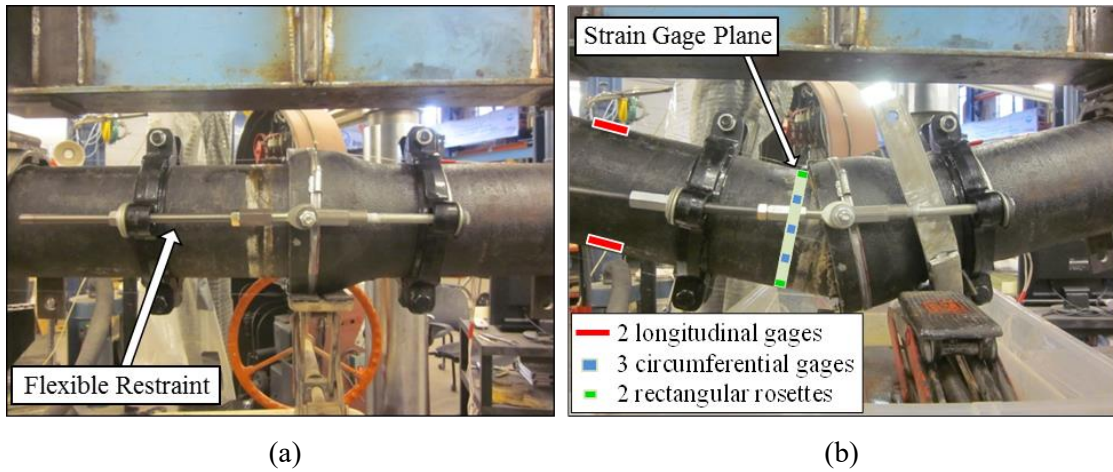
(a) Profile view of pipe joint at 33 mm (1.3 in.) axial displacement prior to imposed deflection. (b) 6.4 mm (0.25 in.) initial axial displacement test at maximum rotation of 26.6°
